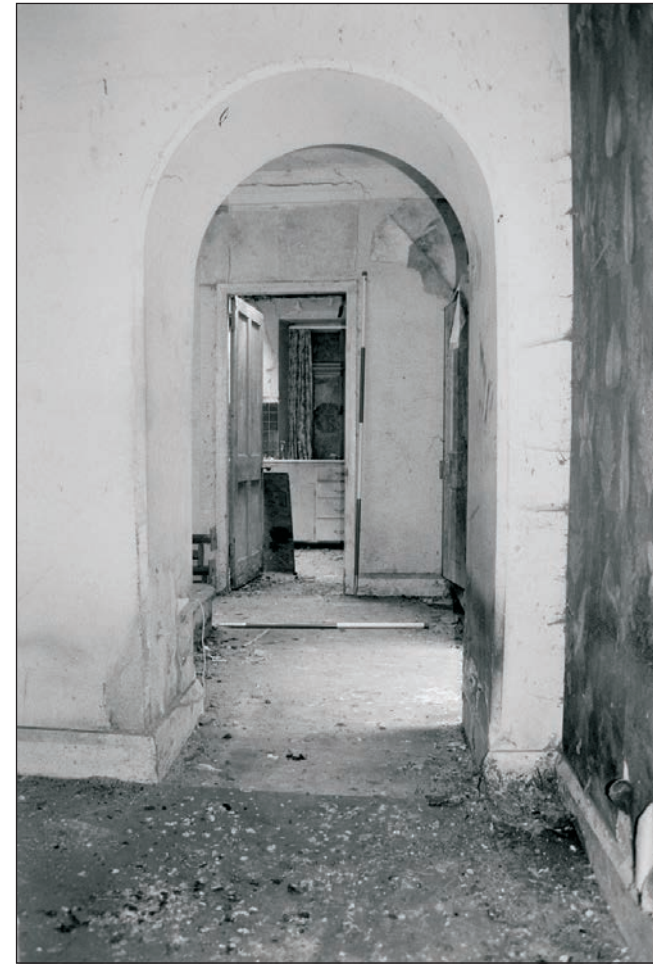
View of G5 with rooms G6 and G7 beyond, Building 3 (Film 28.07)
